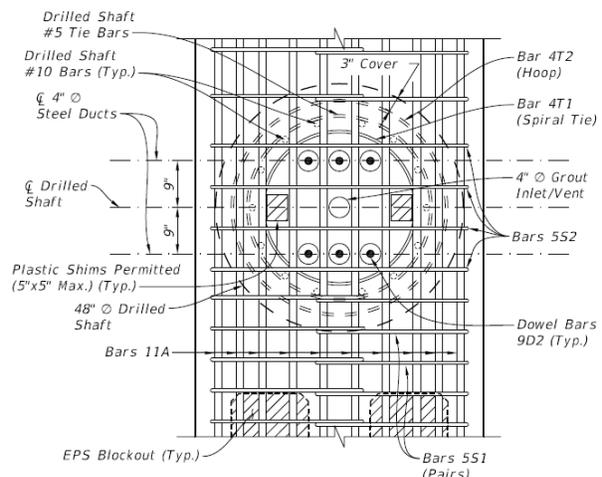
Plan view of precast intermediate bent cap at grouted duct connection (US 90)
